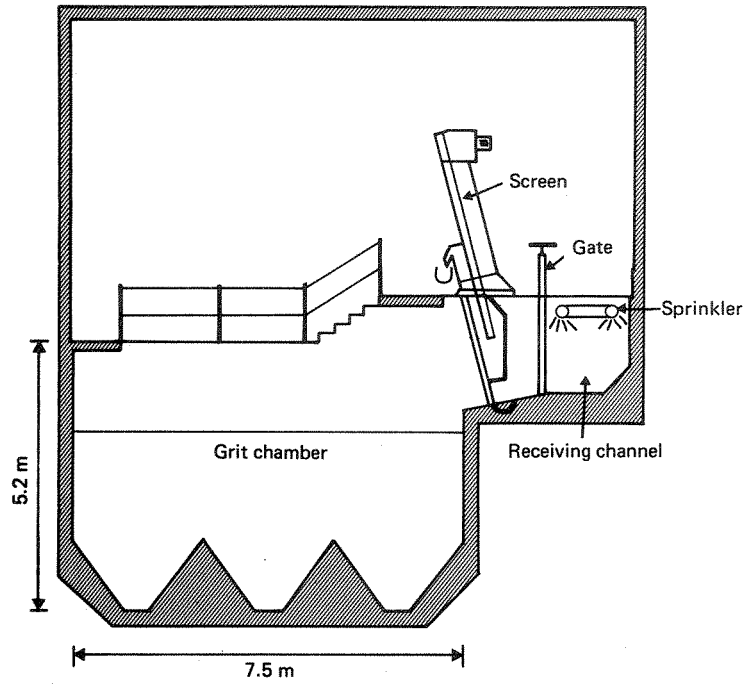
Crosssection through the grit chamber at Lillehammer Treatment Plant, Norway.
